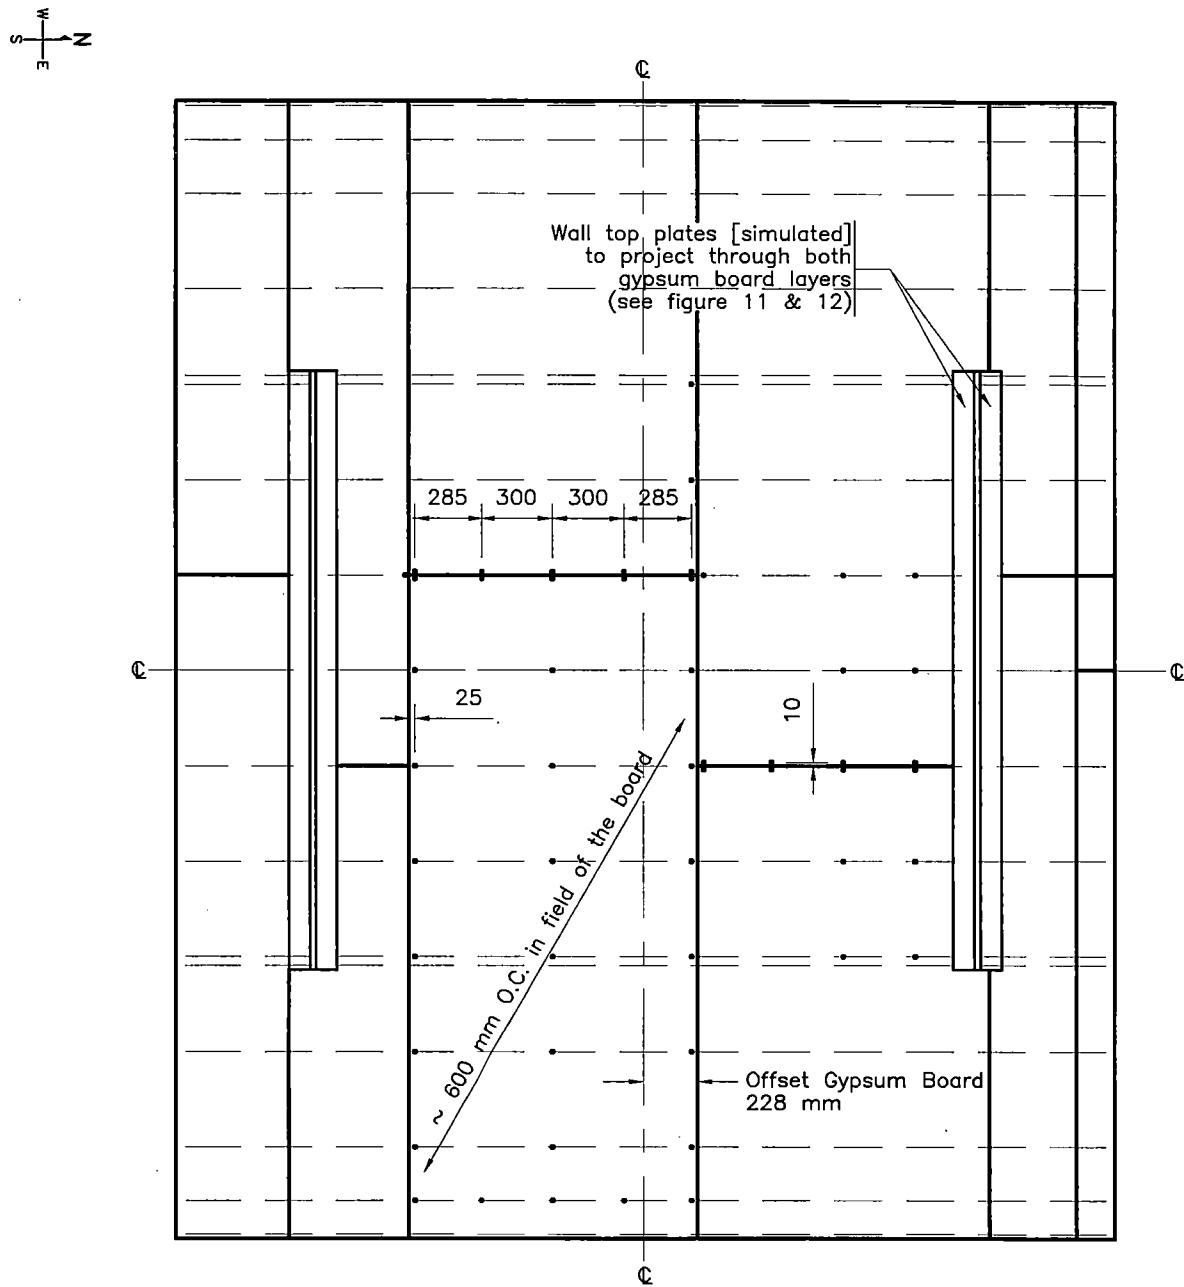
Assembly No. 2, Wood Joist Floor Layout
